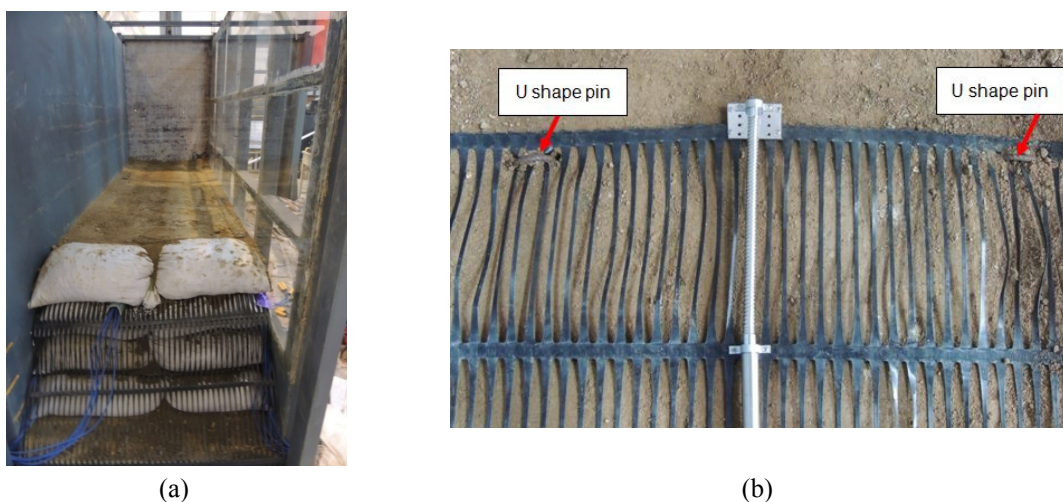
Arrangement of reinforcement layers: (a) Wrapped around facing; (b) U-shaped pins to anchor the reinforcement layers
